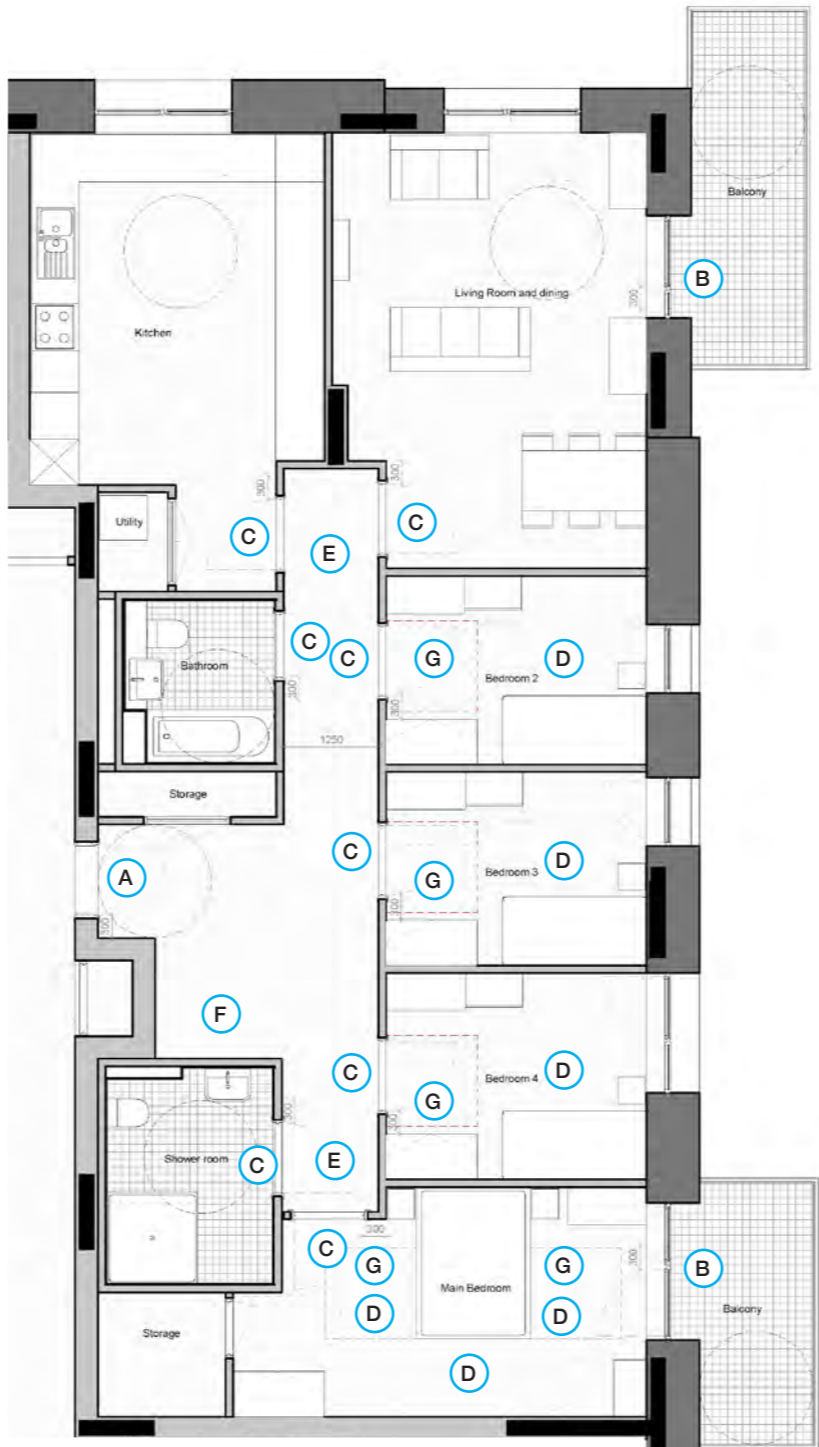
Typical 4 Bedroom 5 Persons accessible layout (Social Rent)
